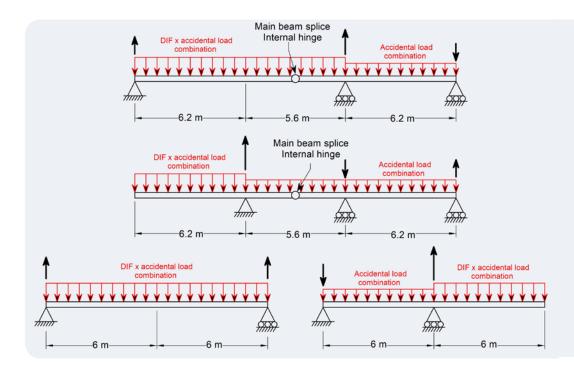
Free body diagram of double section beams after removal of a column in a post-an-beam building (central column and 1.5-bay long beams (top), end column and 1.5-bay long beams (middle), central column and 2-bay long beams (bottom left) and end column and 2-bay long beams (bottom right)).
